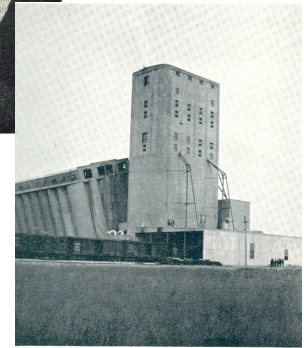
Transcona Silo. Detail of movement after failure showing undamaged work-house.
